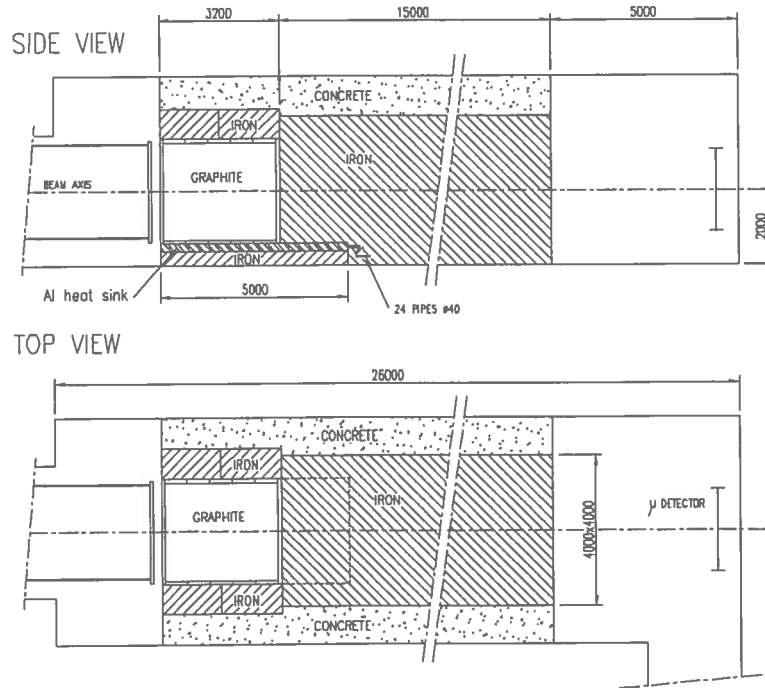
Elevation and plane views of the hadron stop cavern (dimensions in millimetres)
